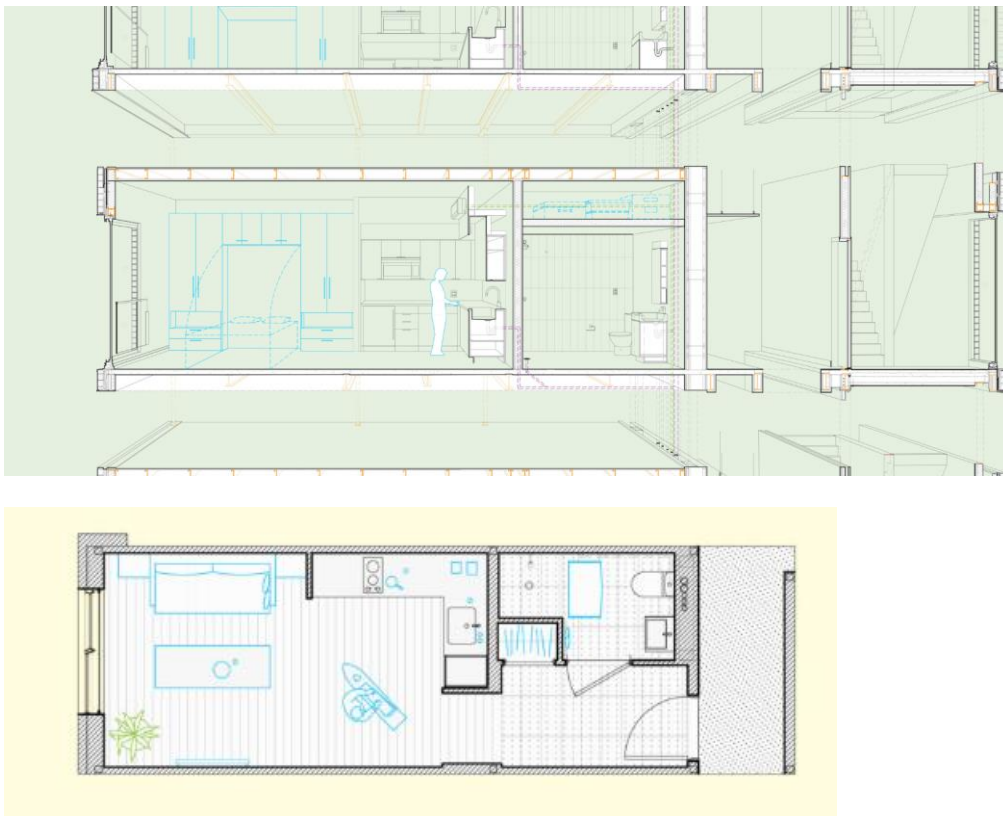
Carmel Place – plan and section (nARCHITECTS; source: official author's website)
